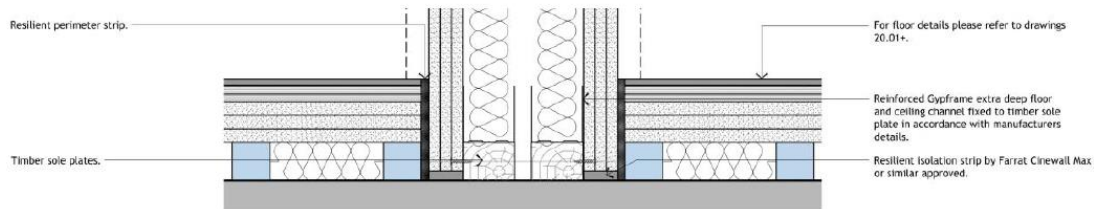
Final design drawings (tender issue) showing timber floating floors and lightweight partitioning
